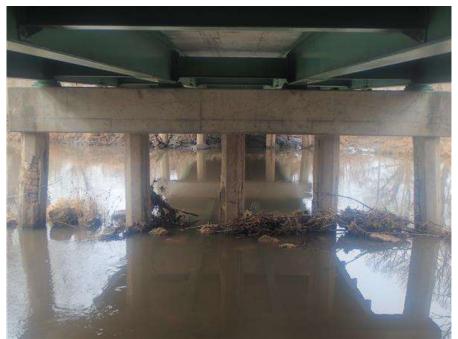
Photo Taken: 02/28/2023 CRACKING, DELAMINATED, SPALLING WITH EXPOSED CIRCUMFERENTIAL REINFORCING AT EAST PIER PILE ENCASEMENTS
